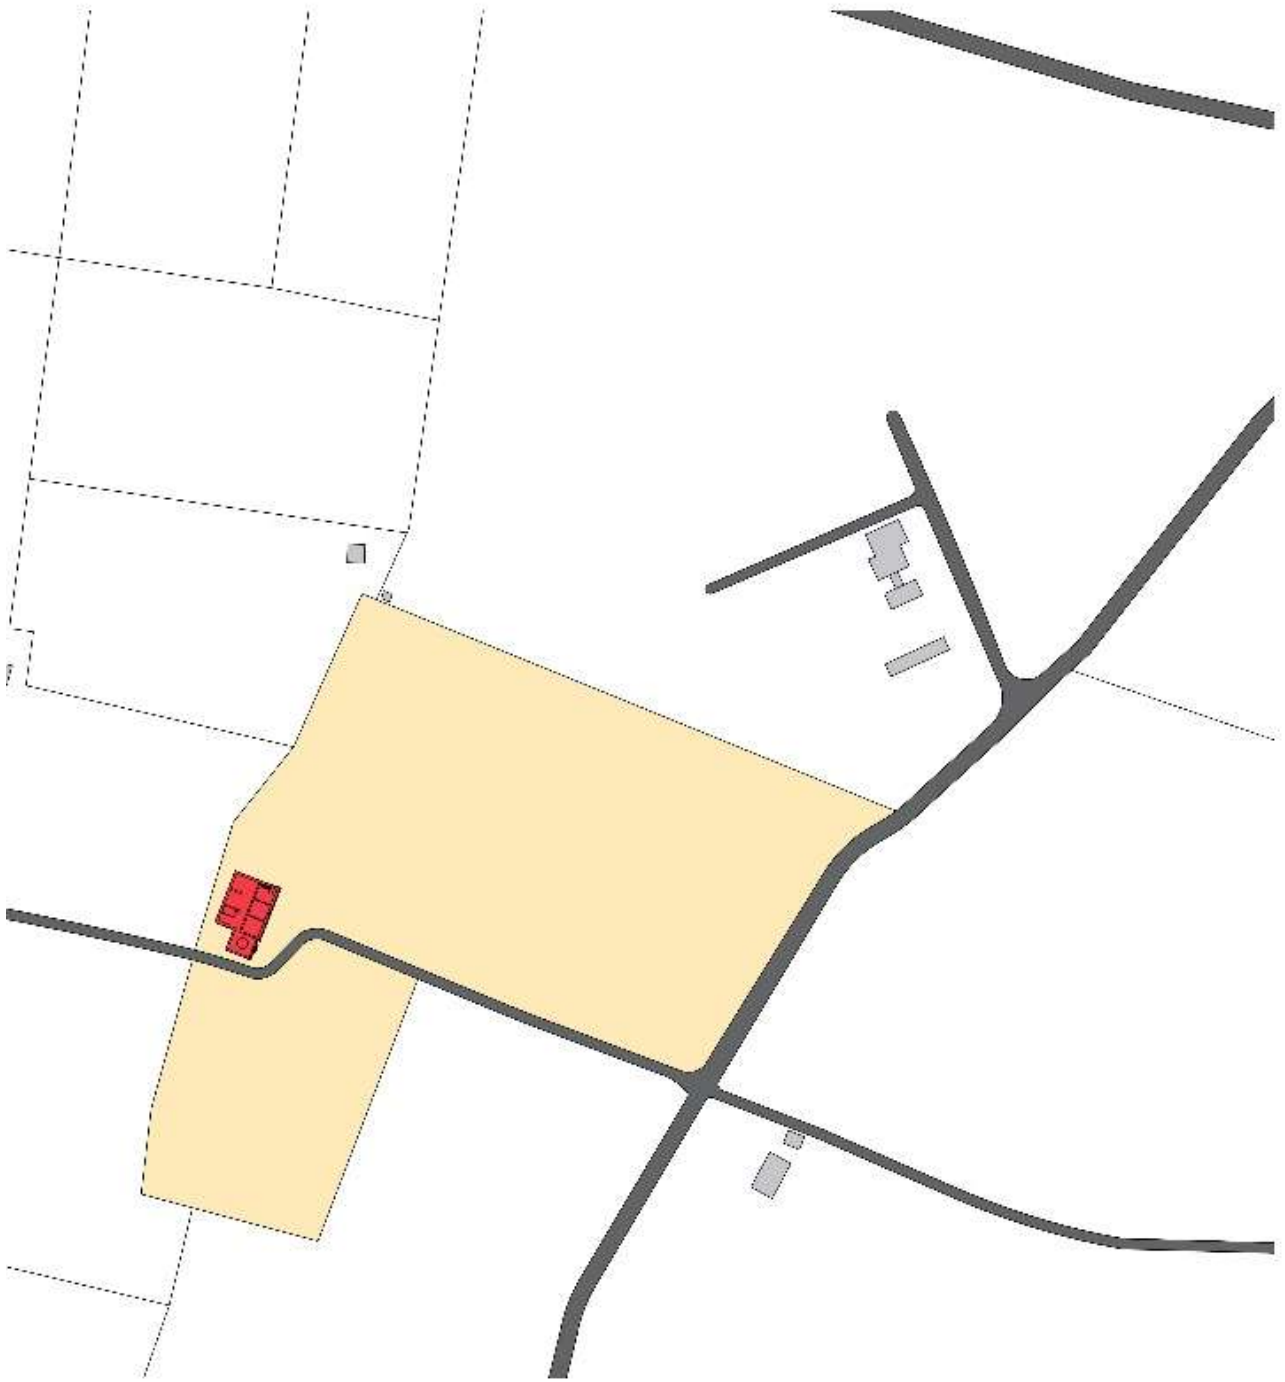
Site plan (Red: Masseria, Yellow: The site)
